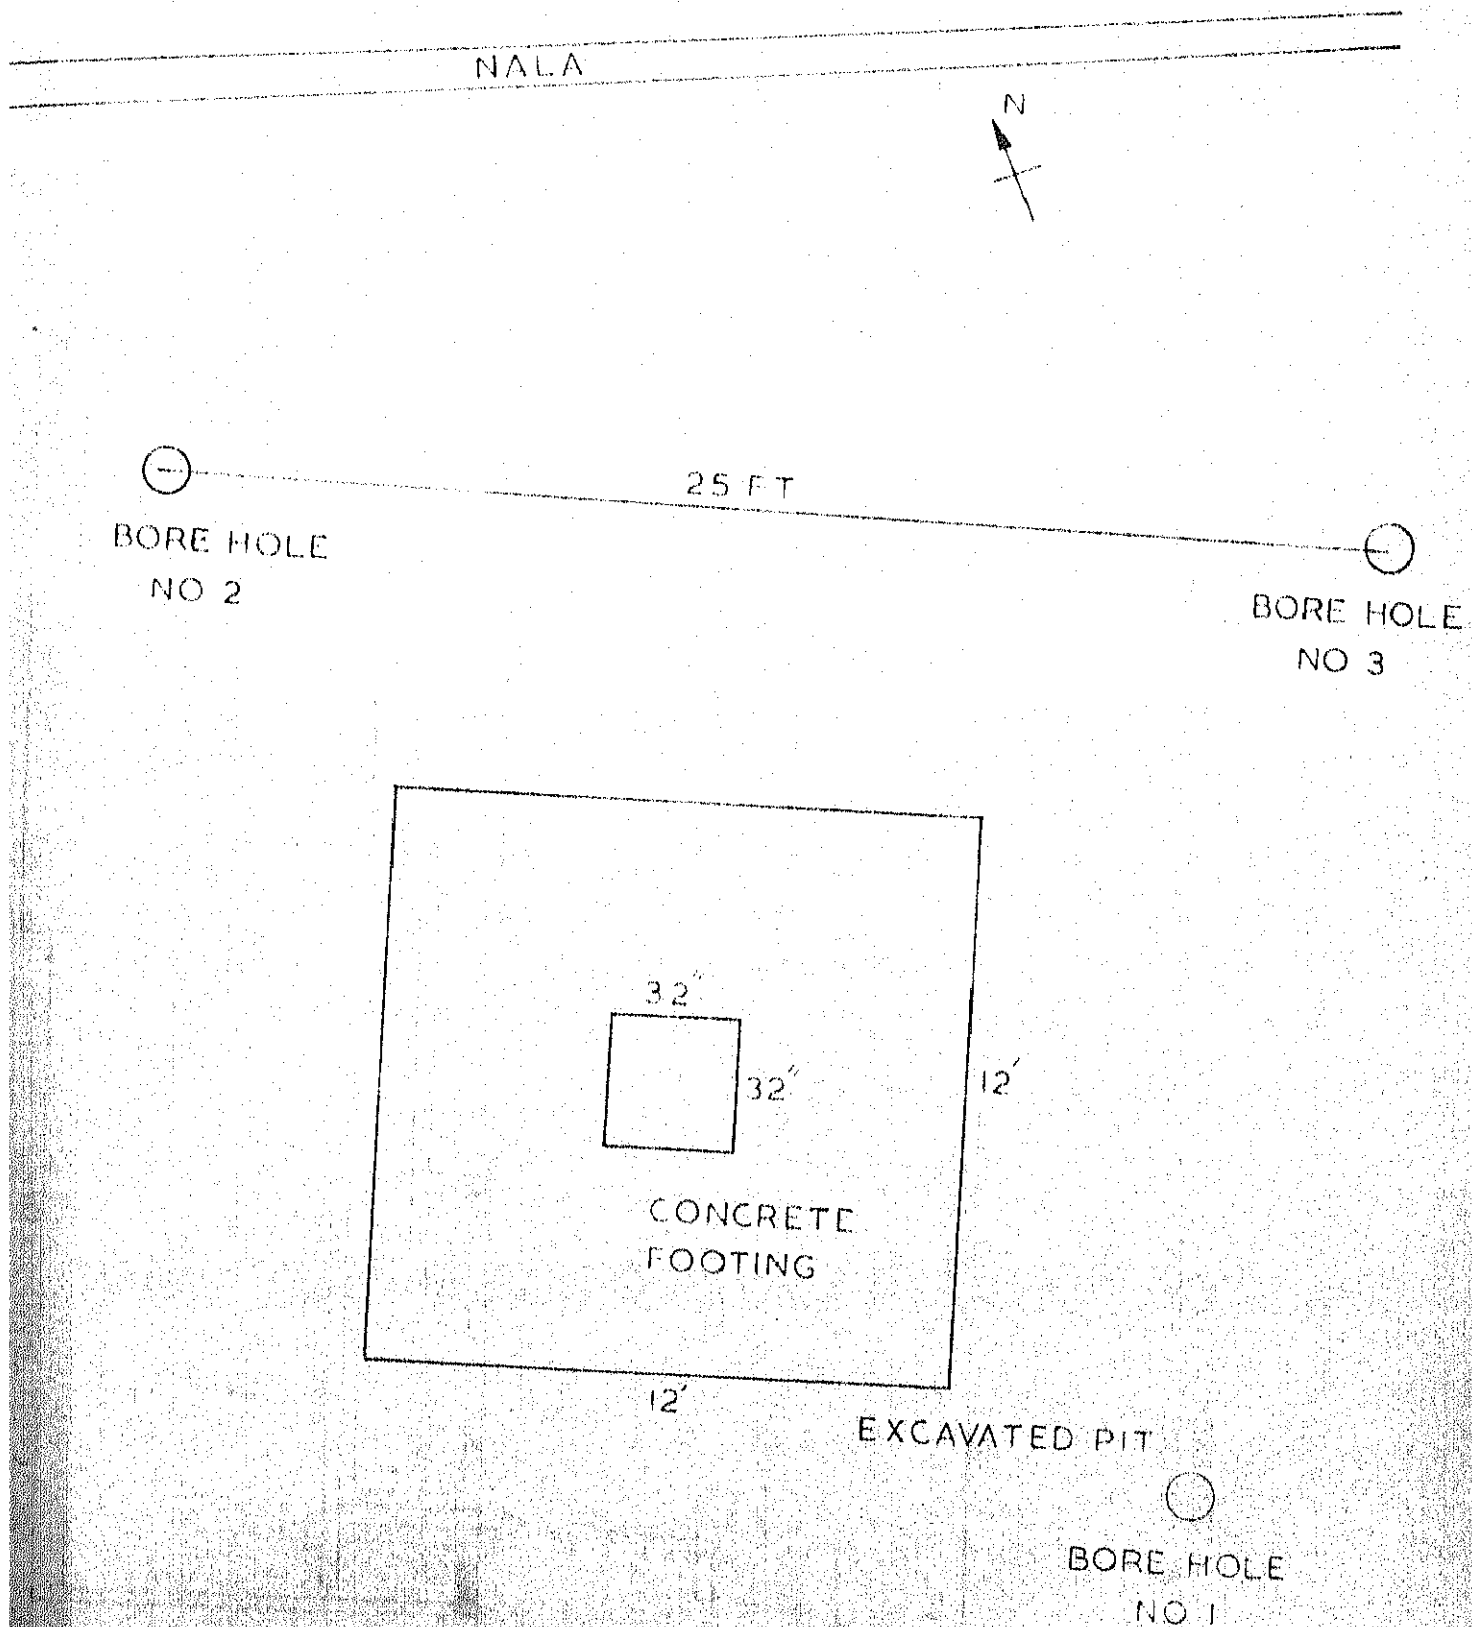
SITE PLAN OF TEST AREA AT CHAKERI, KANPUR
